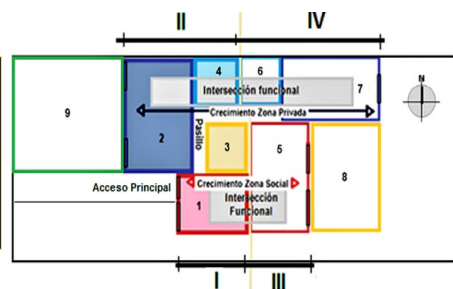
Schematic Floor Plan of the Extended Prototype. References: 1- Living room, 2- Children's bedrooms, 3- Kitchen, 4- Bathroom, 5- Eat, 6- Private bathroom, 7- Bedroom floor, 8- Gallery, 9- Covered garage.
